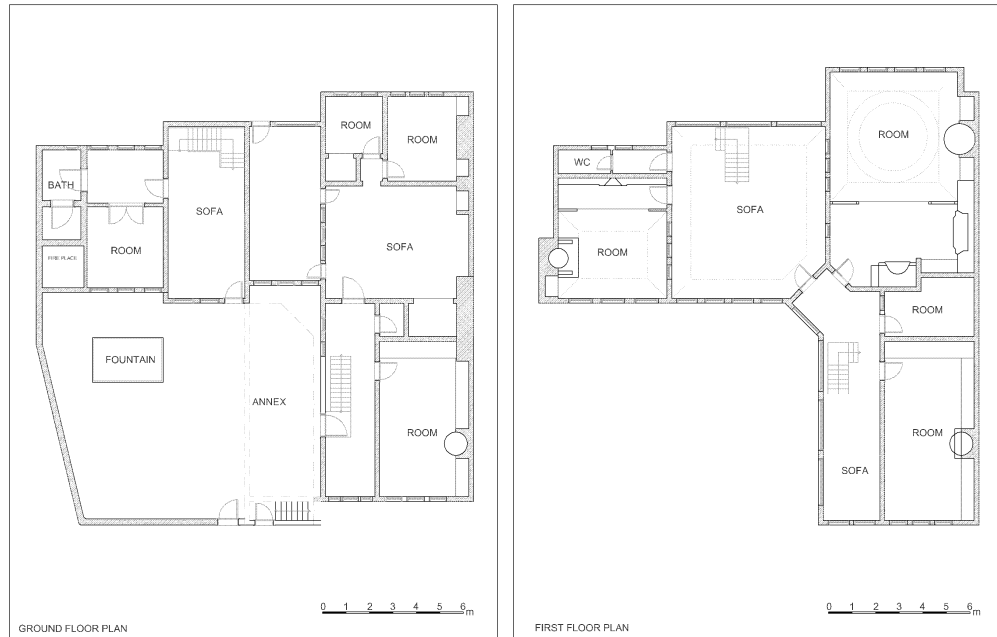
Ya cı Zade Abdullah House Ground Floor Plan
